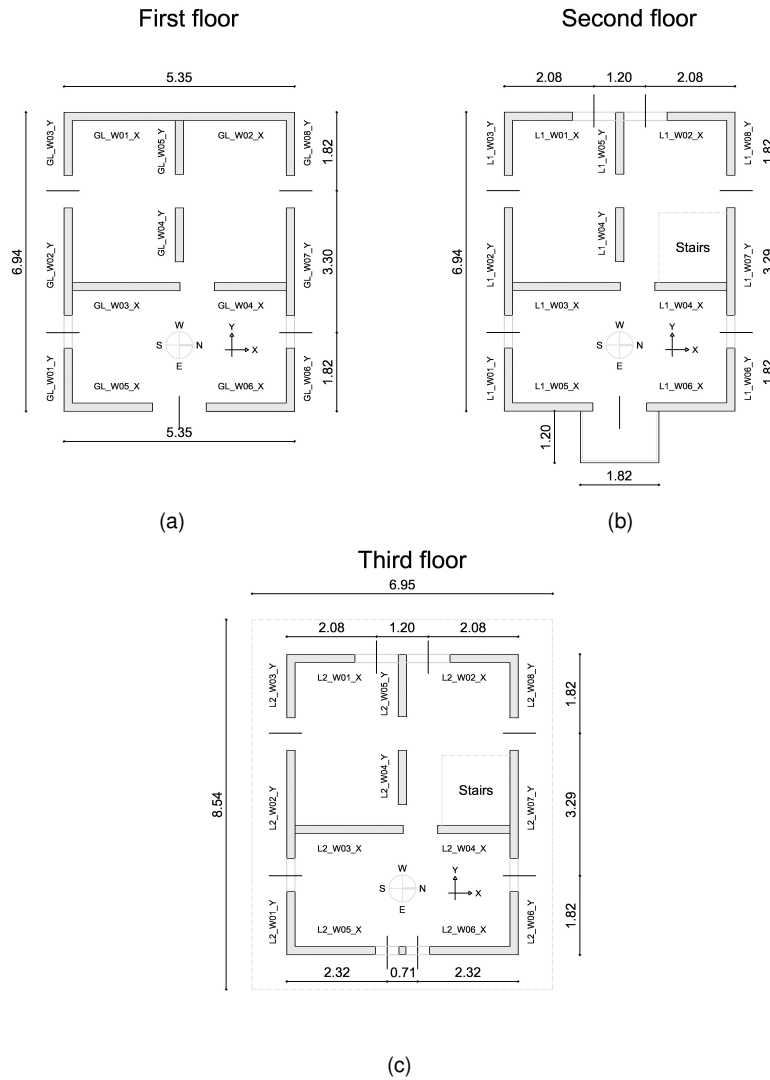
Plans of the building - a) ground floor - b) first floor - b) second floor.
